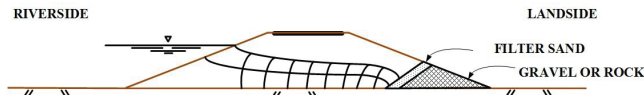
Homogeneous embankment section with pervious toe (after USACE 2000).
